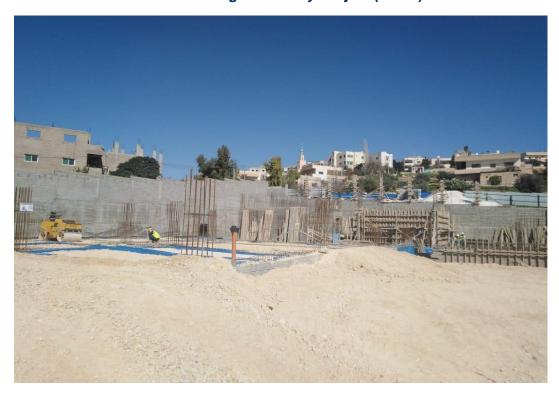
&03: The School consists of five floors with total surface area of 5400 sq.m, in addition to other site works of total surface 4520 sq.m. The proposed building's foundations is completed.
